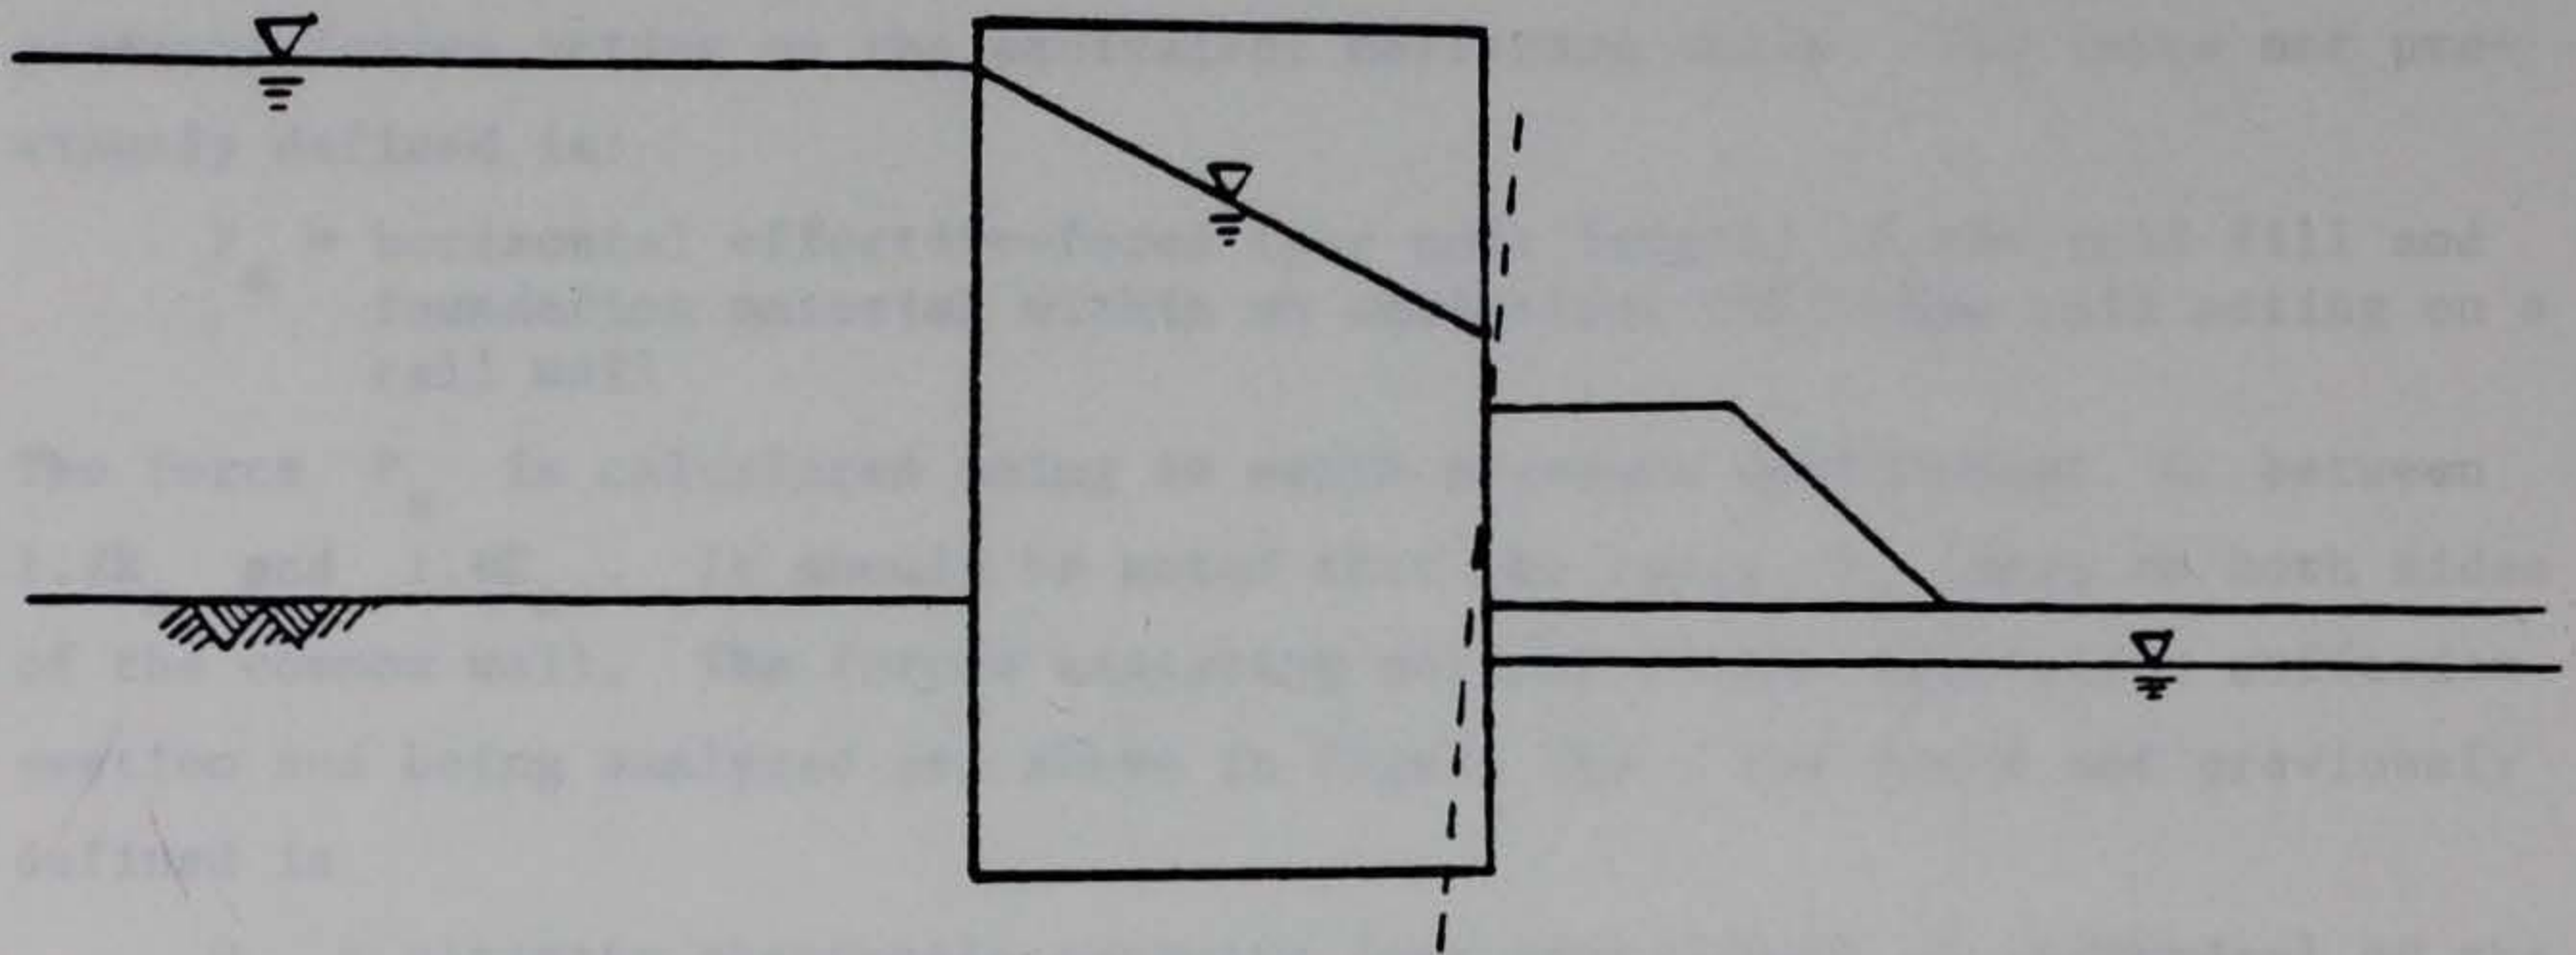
Failure by excessive penetration of inboard sheeting (plunging)
